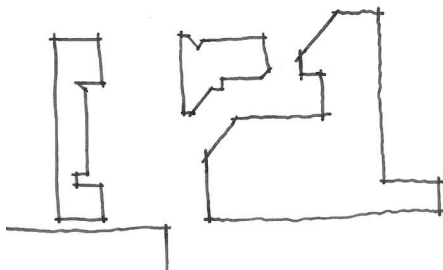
The site as it exists today. A thin masonry wall separates the pedestrian arcade from the site. (Source: Author)
